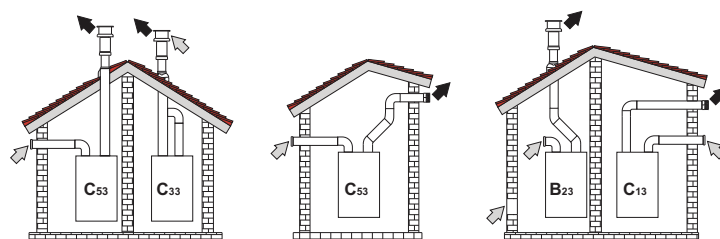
Examples of connection with separate pipes (→ = Air / → = Fumes)
